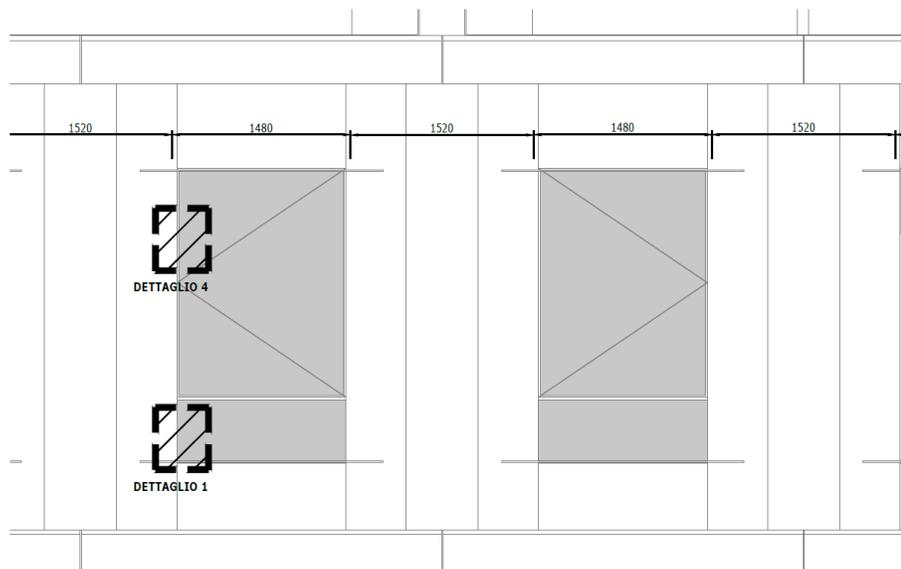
East Elevation WT-1C Typical façade module- Key Elevation. Source: Author
